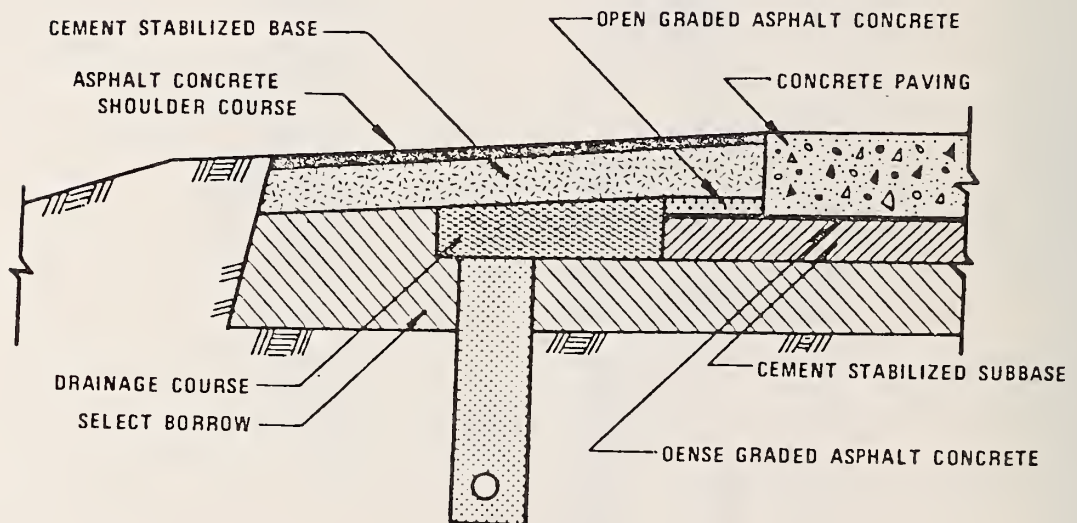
Common Illinois Cross Section with Shoulder Construction Resulting in Bathtub Type Design that Retains Water in Contact with Pavement.
